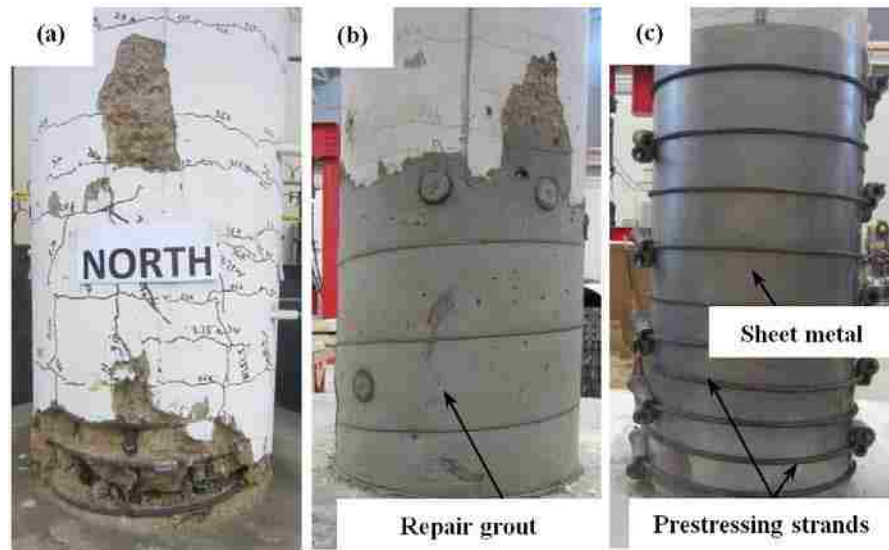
Details of the hybrid repair jacket: (a) damaged column; (b) the damaged column restored to original cross section; (c) thin sheet metal wrapped around the column with prestressing strands.
